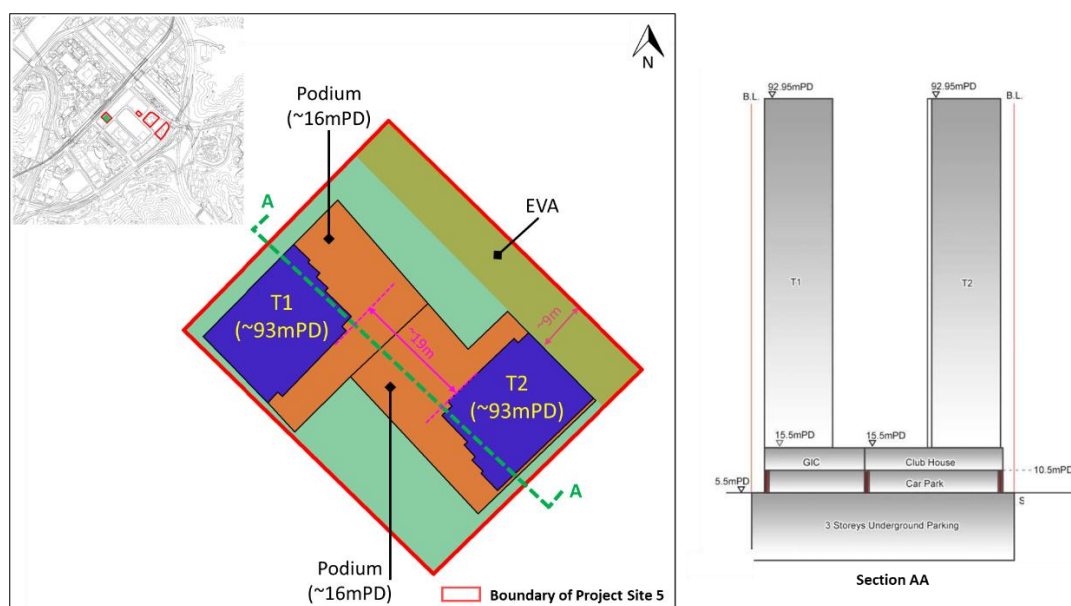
(e) Indicative Development Layout and Cut Section within Project Site 5
